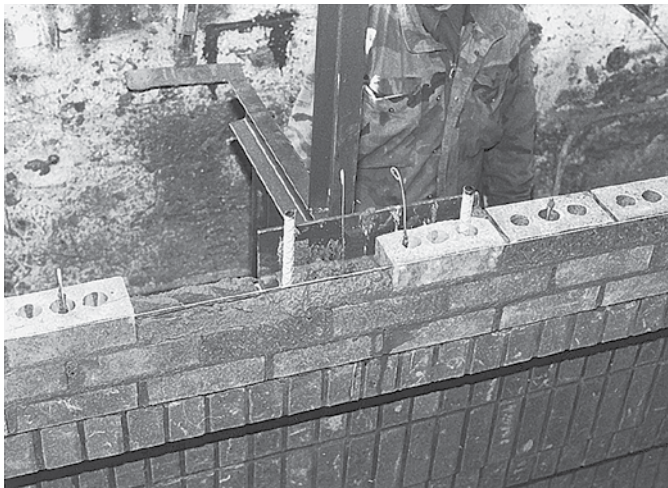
shows the use of *prefabricated reinforced brick panels* for cladding. Masons construct the panels while working comfortably at ground level in a dry, climate-controlled
